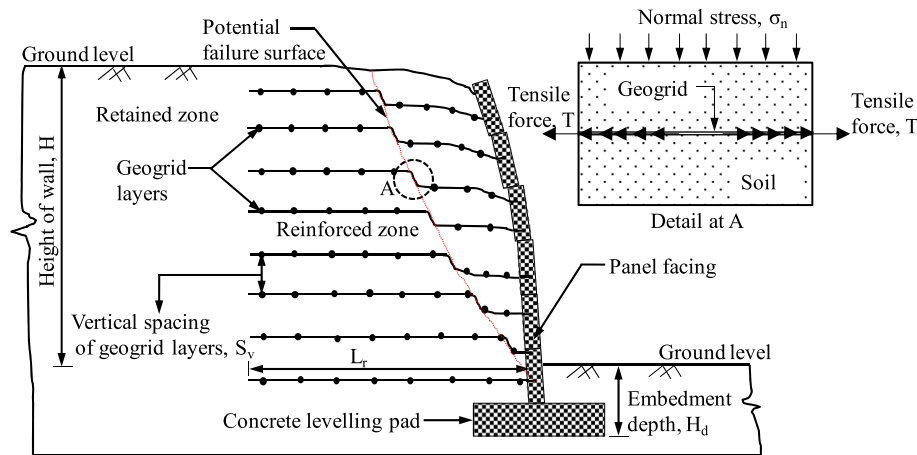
Schematic cross-section of a typical geogrid reinforced soil wall at the onset of failure.
